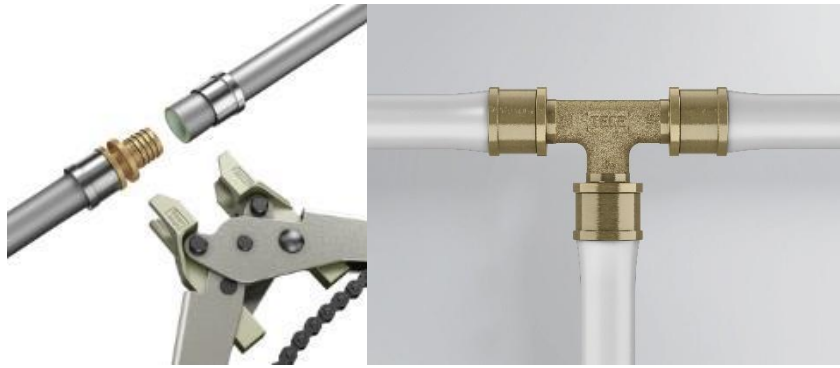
Joint during preparation together with a tool for stabilising rings sliding and a complete, joined T-connector
